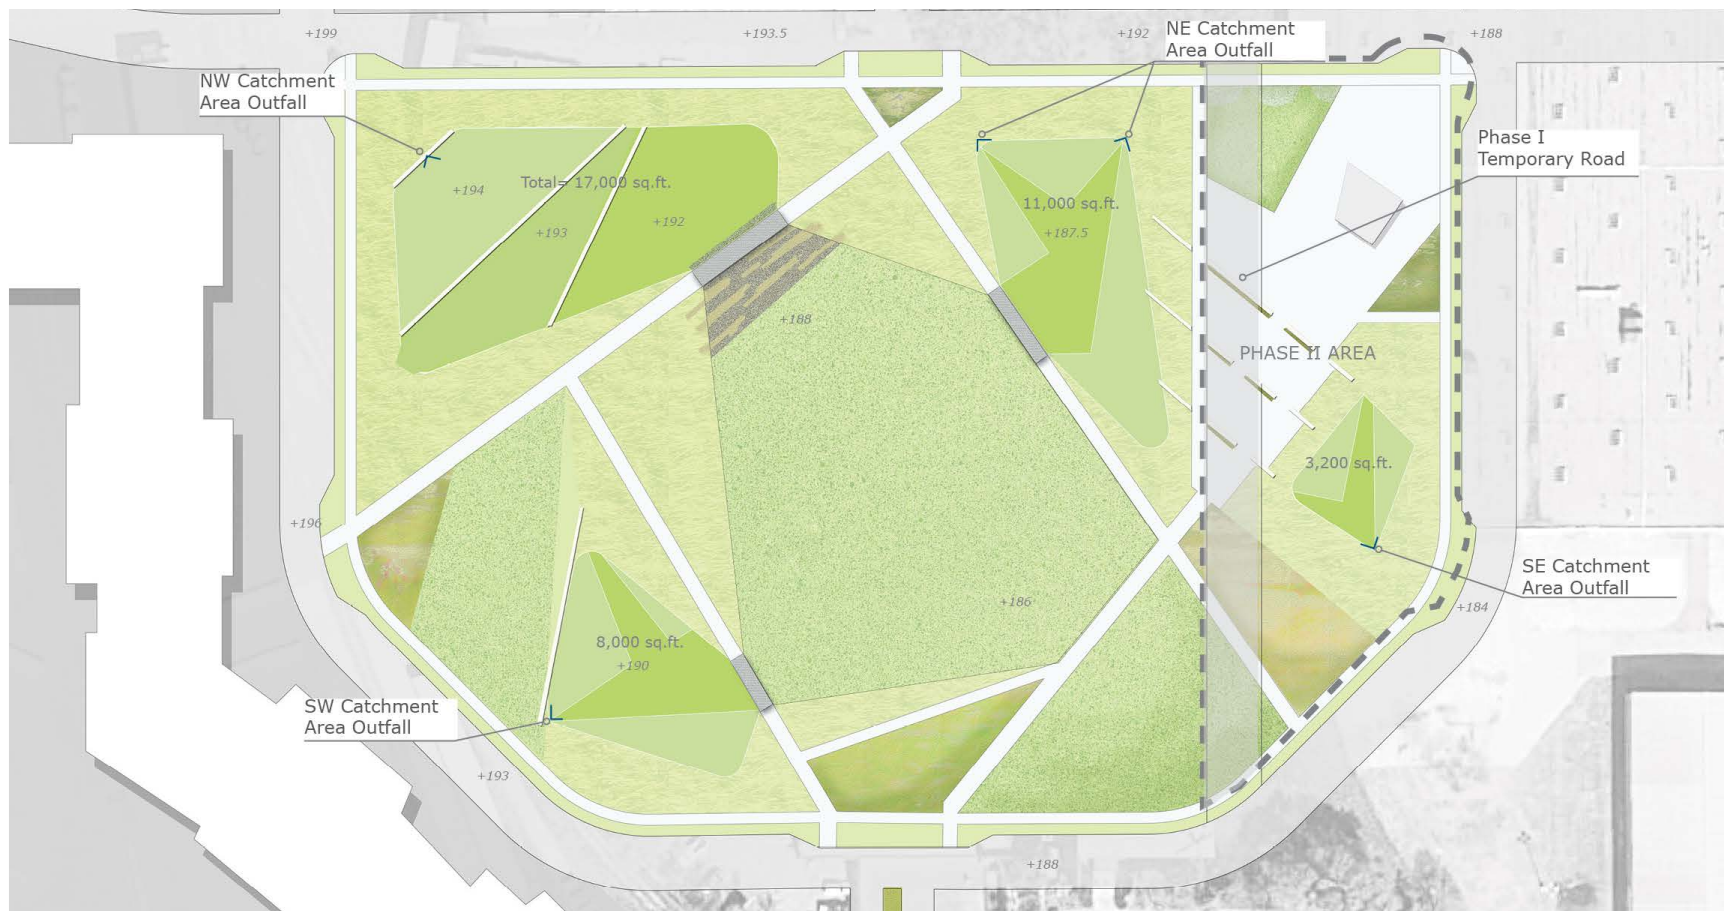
Curfew Commons Concept: Illustrative Plan- Ground Plane Detail
